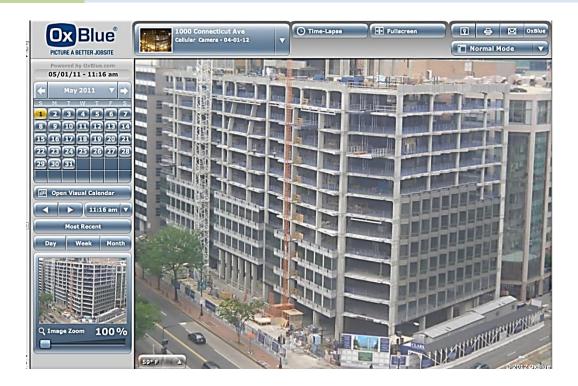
Concrete tops out in May 2011 and the early stages of glass curtain wall installation
